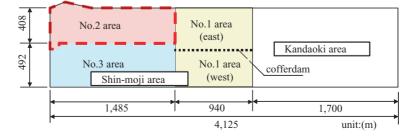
Plan view of New Kita-Kyushu airport construction site.
